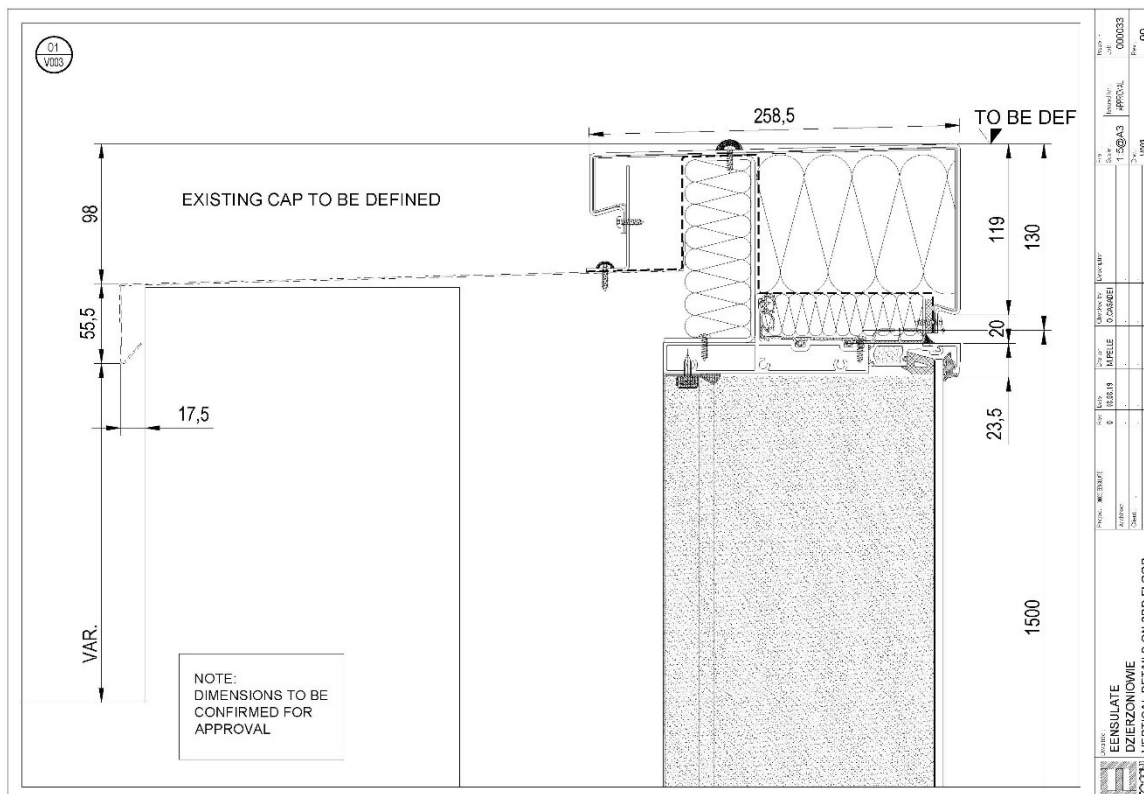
Polish Primary School: Vertical details on 3rd floor.
